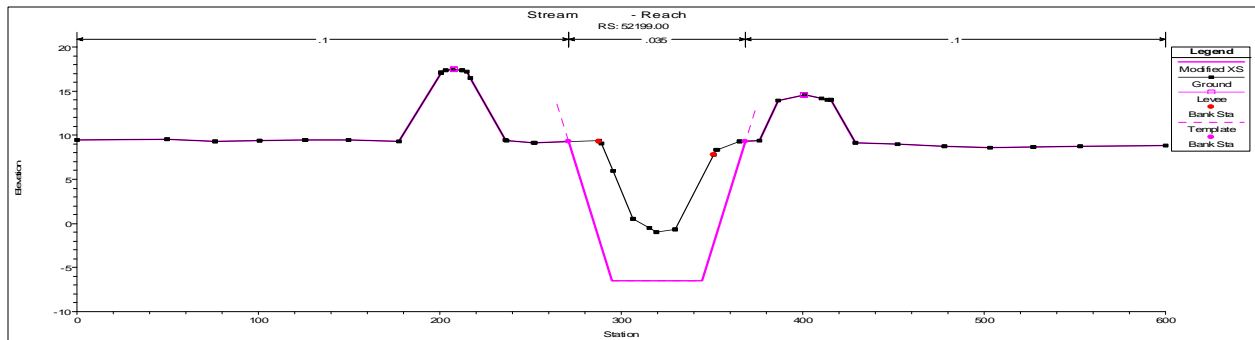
TYPICAL CROSS SECTION OF SCENARIO 1 IMPROVEMENT; SOUTH LEVEE (LEFT), NORTH LEVEE (RIGHT) (ELEVATIONS IN NAVD)
